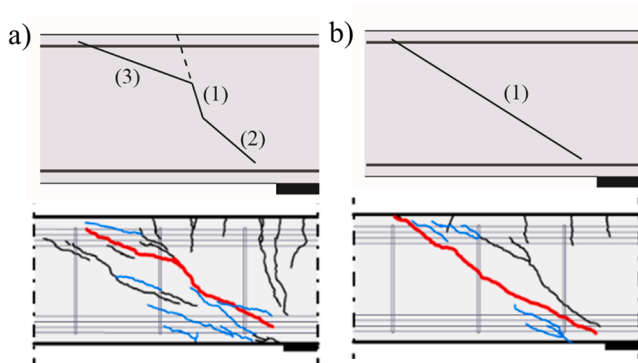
Crack development process: (a) critical shear crack from a flexural crack (B2C-R1-S2-L1); (b) critical shear crack as a diagonal crack in the web (B3C-R1-S3-L).
